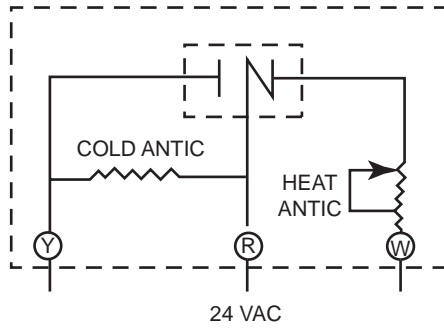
Heat/Cool Thermostats 31-100 and 31-102.
